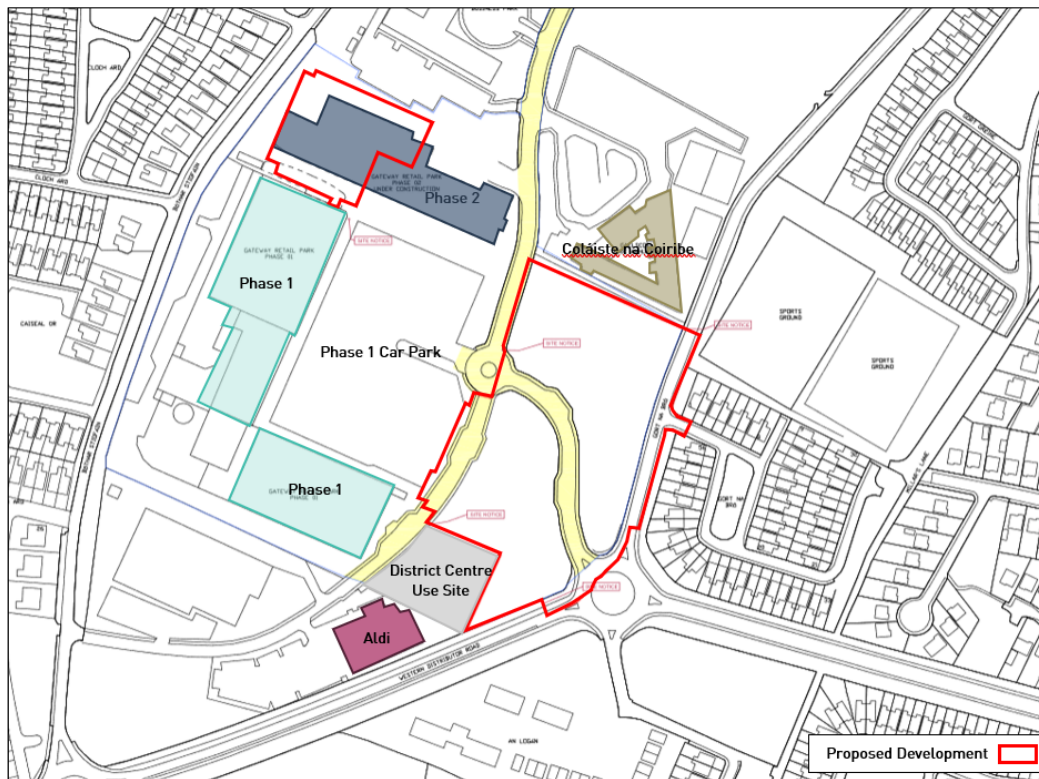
Proposed Site Masterplan for Knocknacarra District Centre
